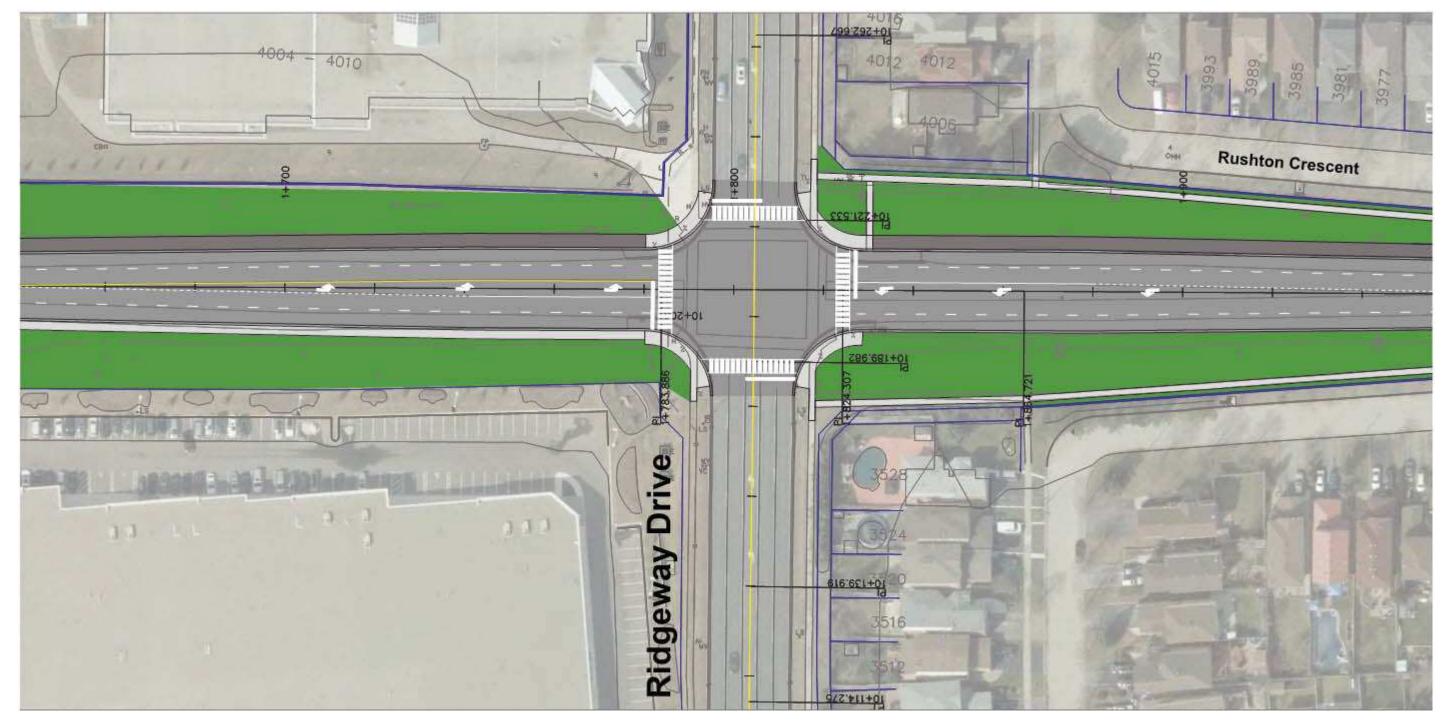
Alternative Design Concept #2 - Widen Burnhamthorpe Road West to 4 Lanes (No intersection Improvements at Ridgeway Drive)
